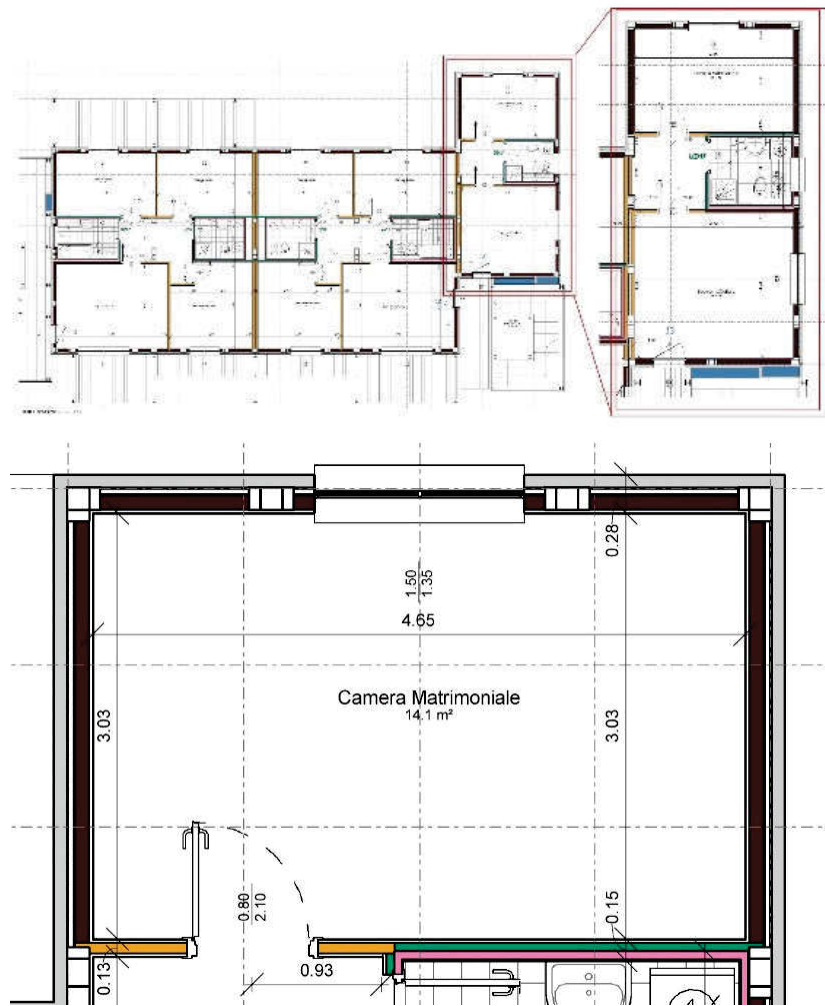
Plan view of the building (up) and the bedroom analysed during the in-situ tests (down).
